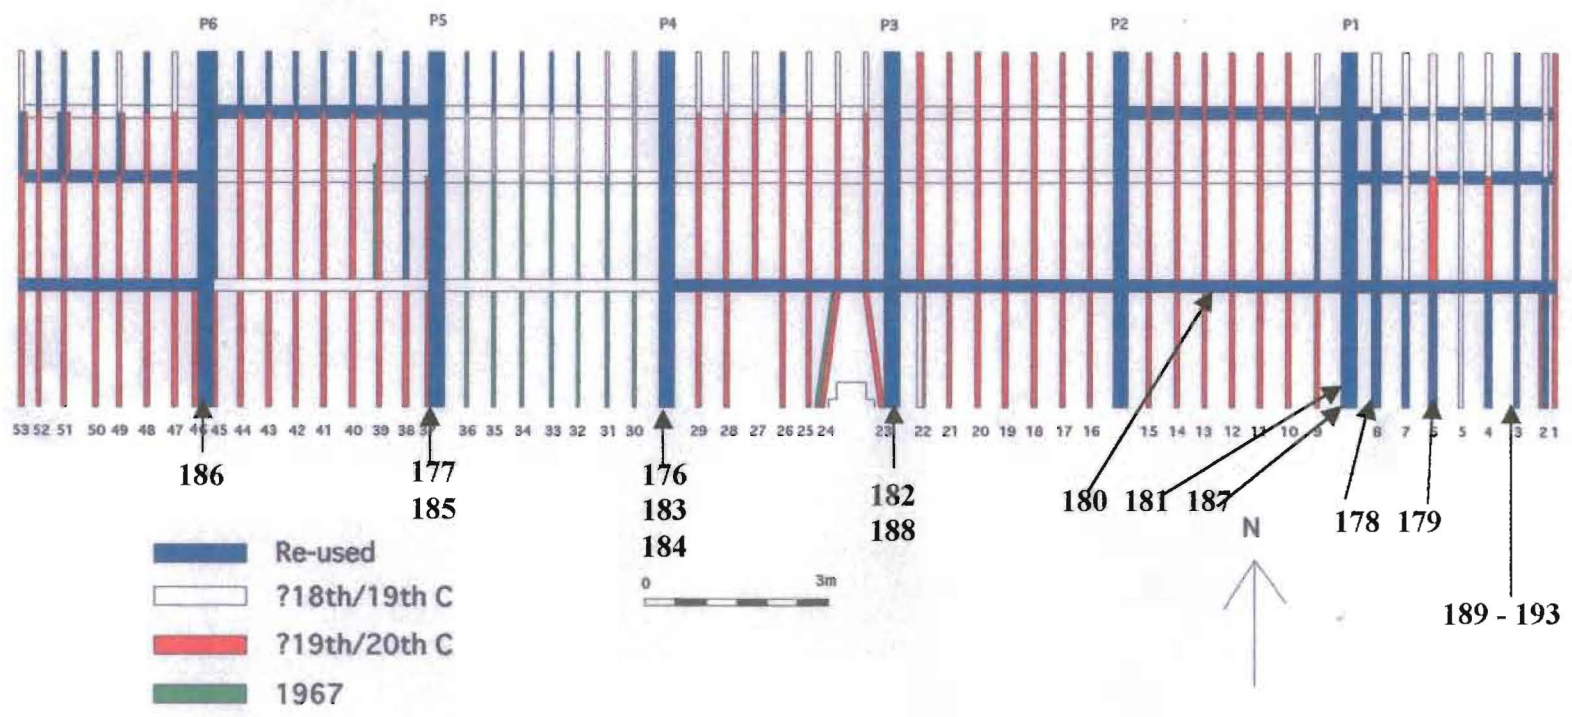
Long-section of the Lady Chapel south aisle roof to show possible phasing of timbers and position of timbers sampled (viewed from the south looking north)
